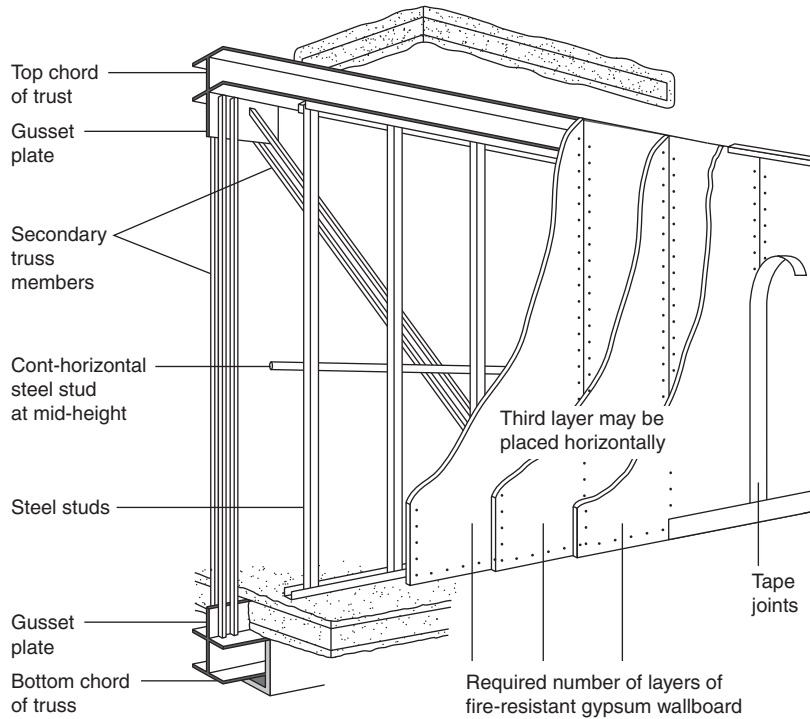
Staggered truss protection with envelope protection.³³
